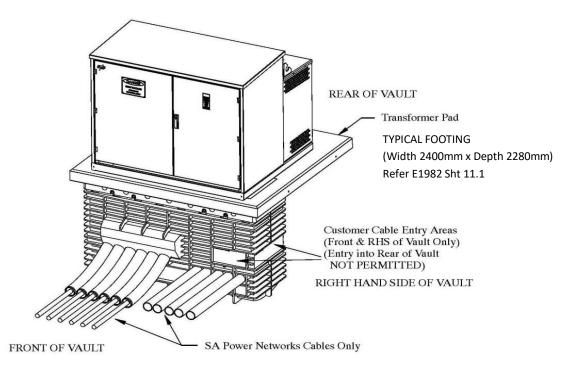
Typical Footing Arrangement for the Mk7 Padmount Transformer
